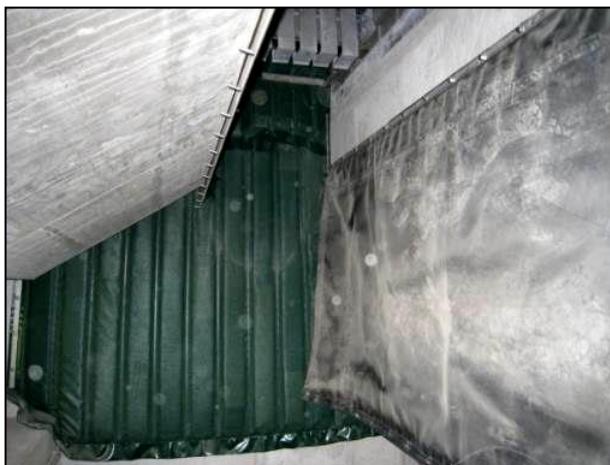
View of space beneath a joint with Robo®Mute noise protection, with longitudinal membrane disconnected at one side and hanging loose to allow inspection of joint
